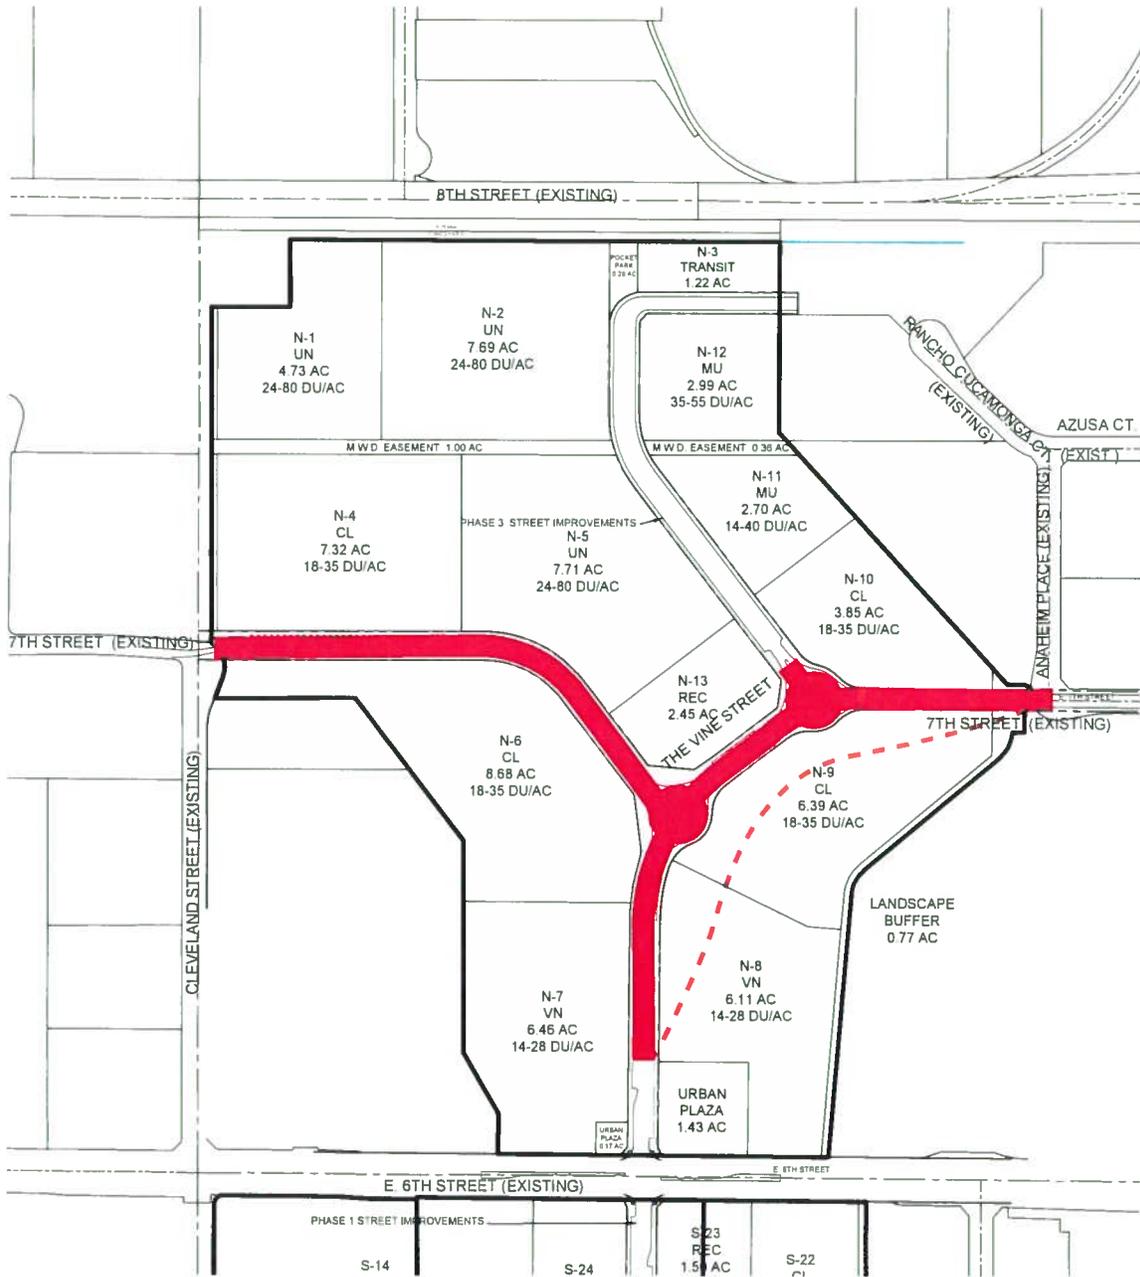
Conceptual Phase 2 Street Improvement Facilities Plan
